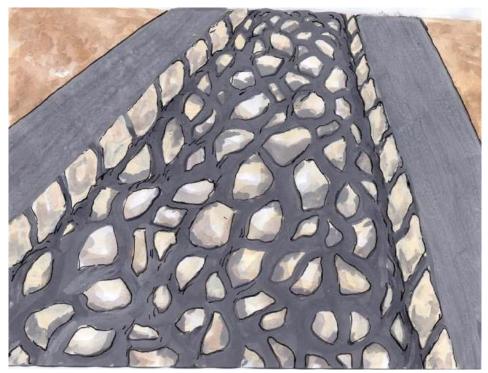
Do not waste mortar making the surface smooth and flat. You are not building a garden or house wall and roughness will do more to slow water.
